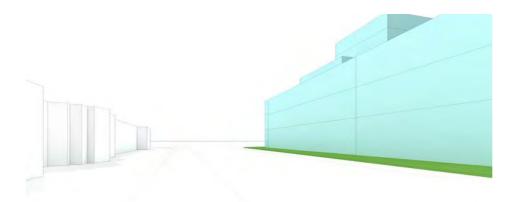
View from Coate Avenue illustrating the benefits of a three storey street wall height with significant upper level setbacks that ensure the building is not visually dominant in the street.
